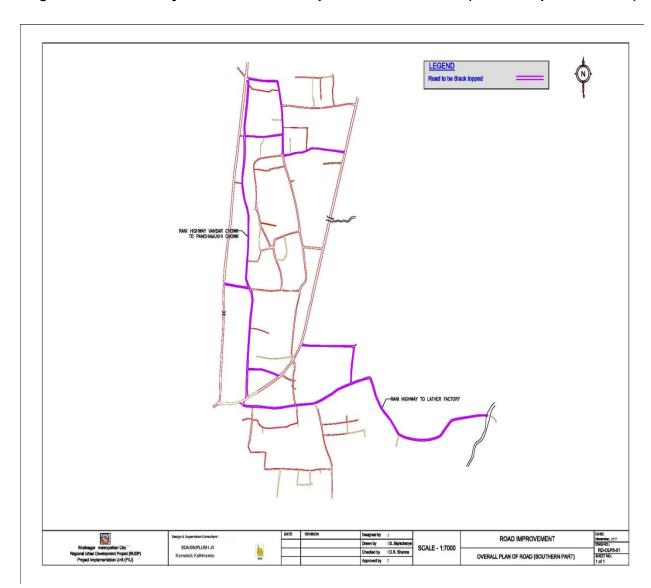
Overall Layout Plan of Road Improvement Networks (Southern part/rani area)
